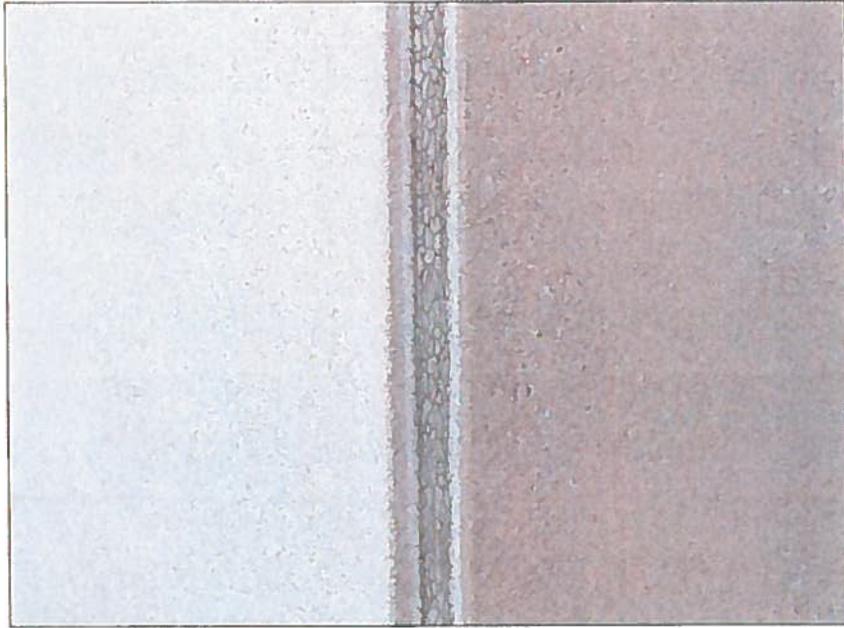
Deteriorated building sealant joint (typical all elevations).
